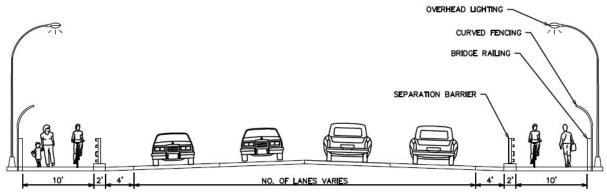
Typical Section of Separation Barrier Added to Existing Crossing
